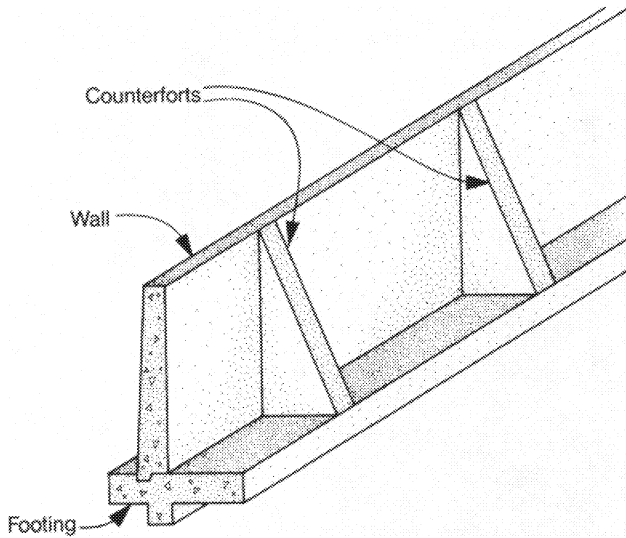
Typical detail of a counterfort retaining wall.
